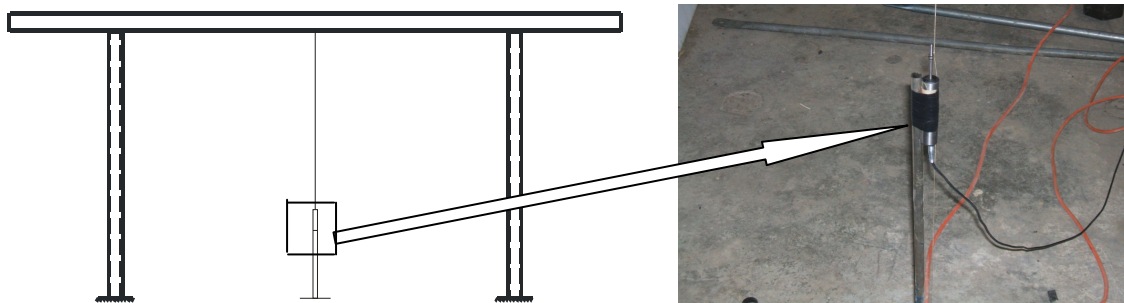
Typical Vertical LVDT located at Gerber Frame Mid-span
